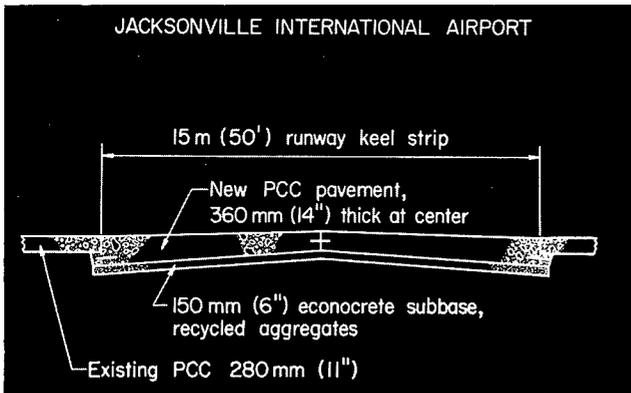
Center 50 ft of runway at Jacksonville International Airport was reconstructed.
